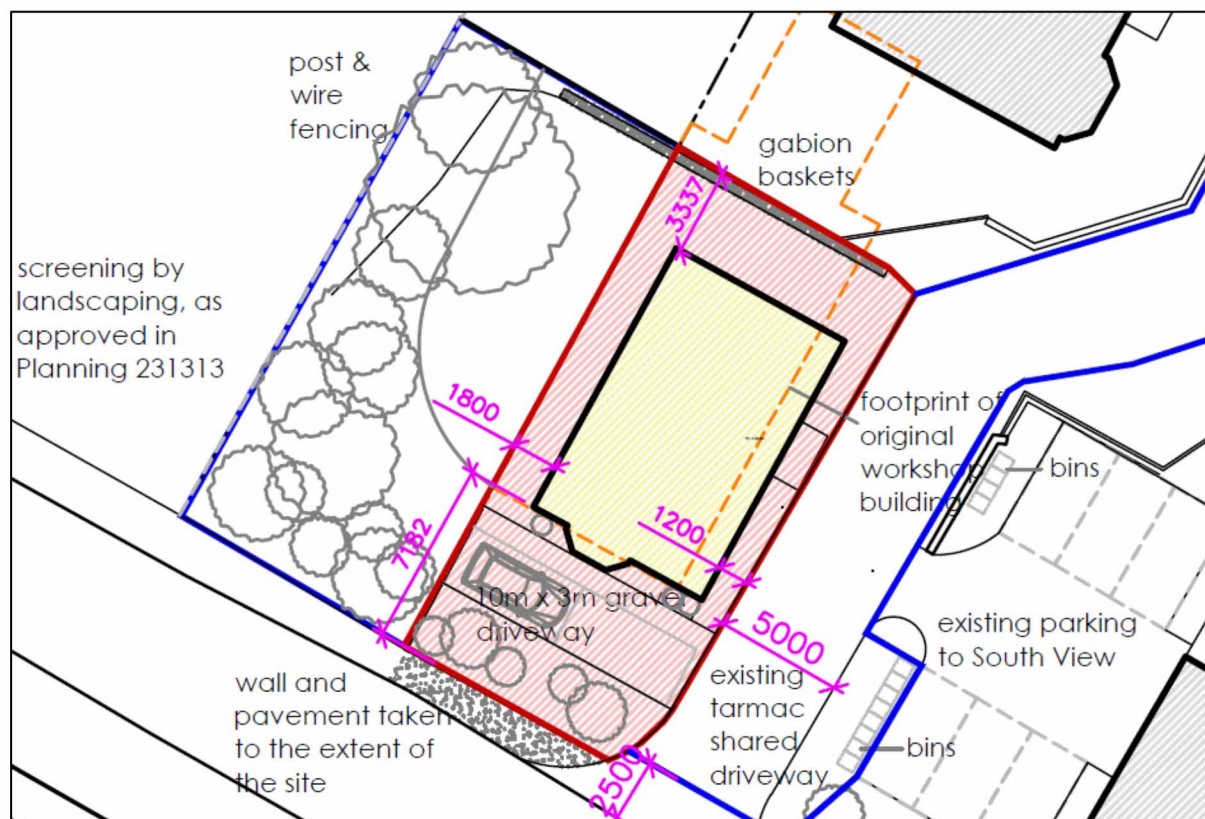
Proposed Site Plan with orange dashed outline representing the indicative footprint of the former workshop building (Source: Ian Rodger Architects)
